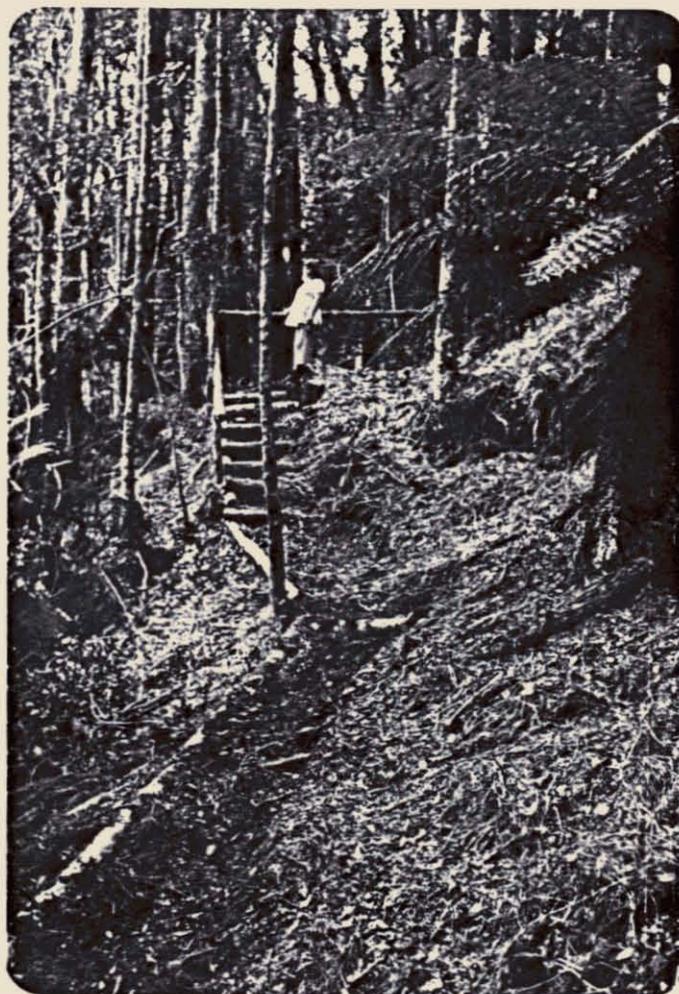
Walking Track Improvements Constructed by Central Tasmanian Tungsten Pty. Ltd.
